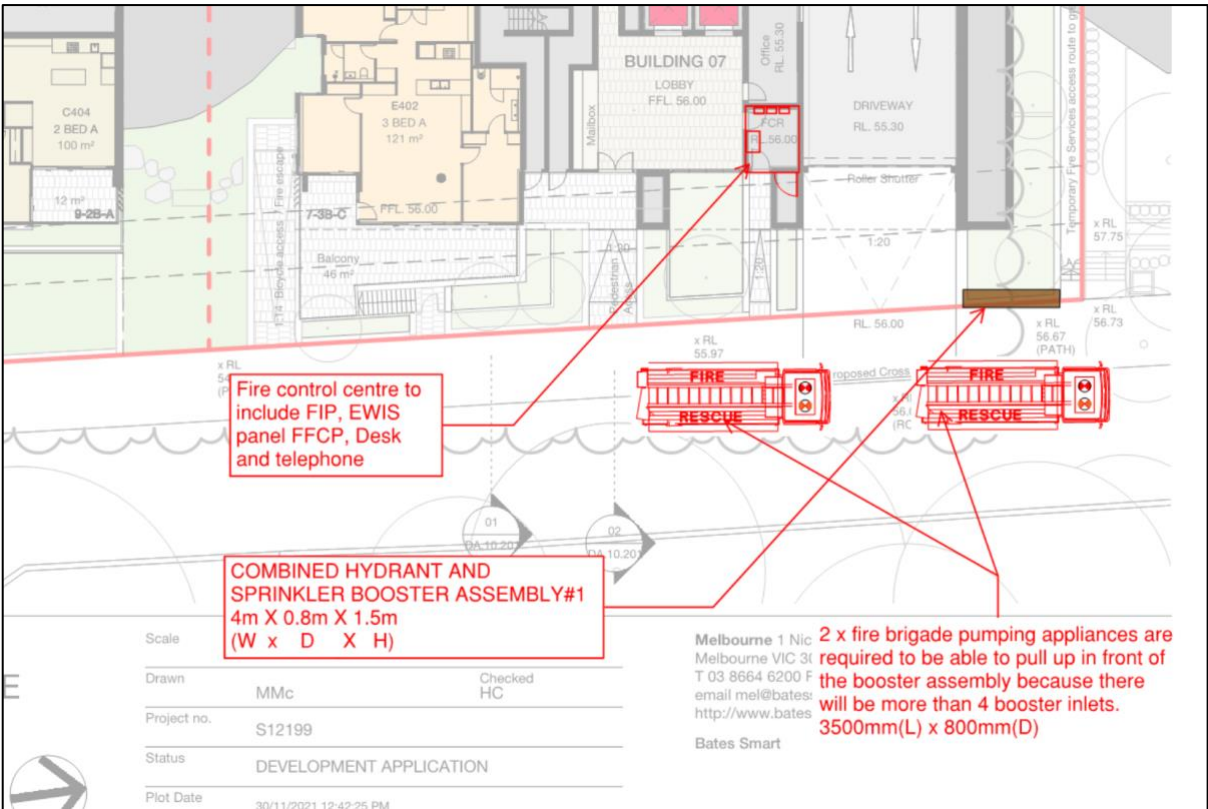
Fire Assembly Located on Canberra Avenue (Level 4 Floor Plan)
